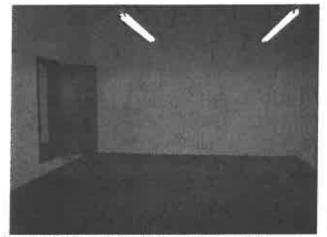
Post Lead-Based Paint Abatement, Walls, Floor, Door Frame and Vault Door.
